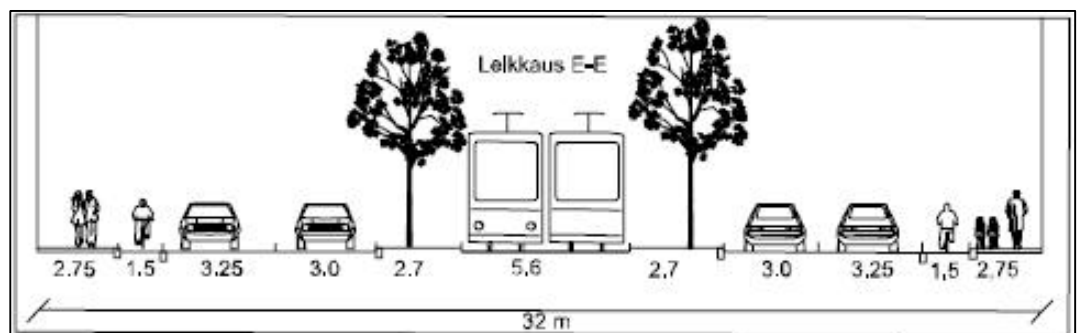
An example of the planned street cross-section in the Traffic Plan (Mechelininkatu street decision-making 2010 - 2014)
